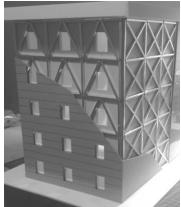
Architectural exterior view of retrofitting by using structural building jacketing system
